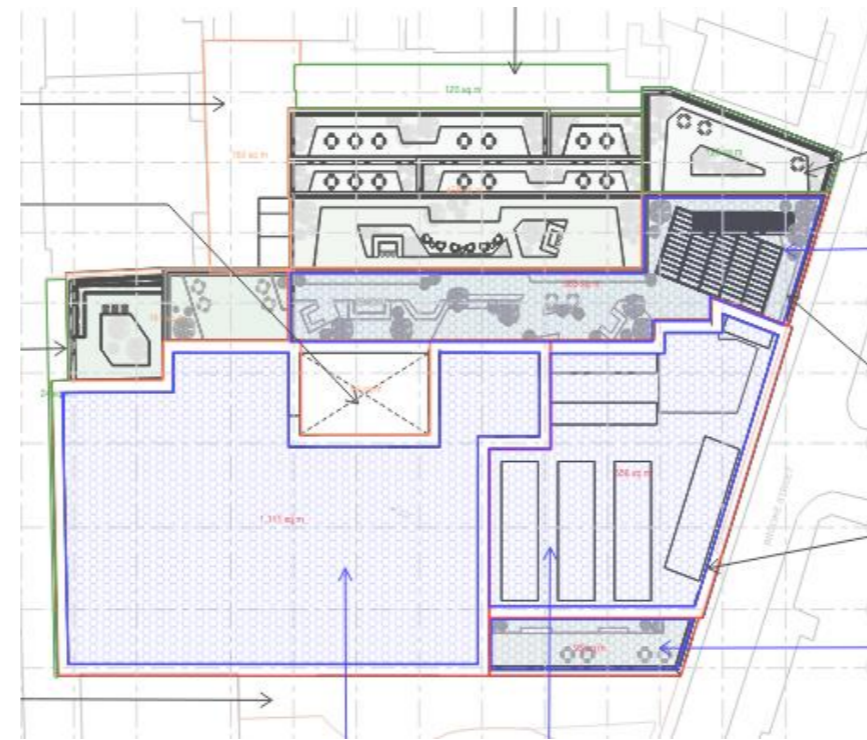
Proposed Blue Roof Areas (Surface Water Catchment Plan extract)
